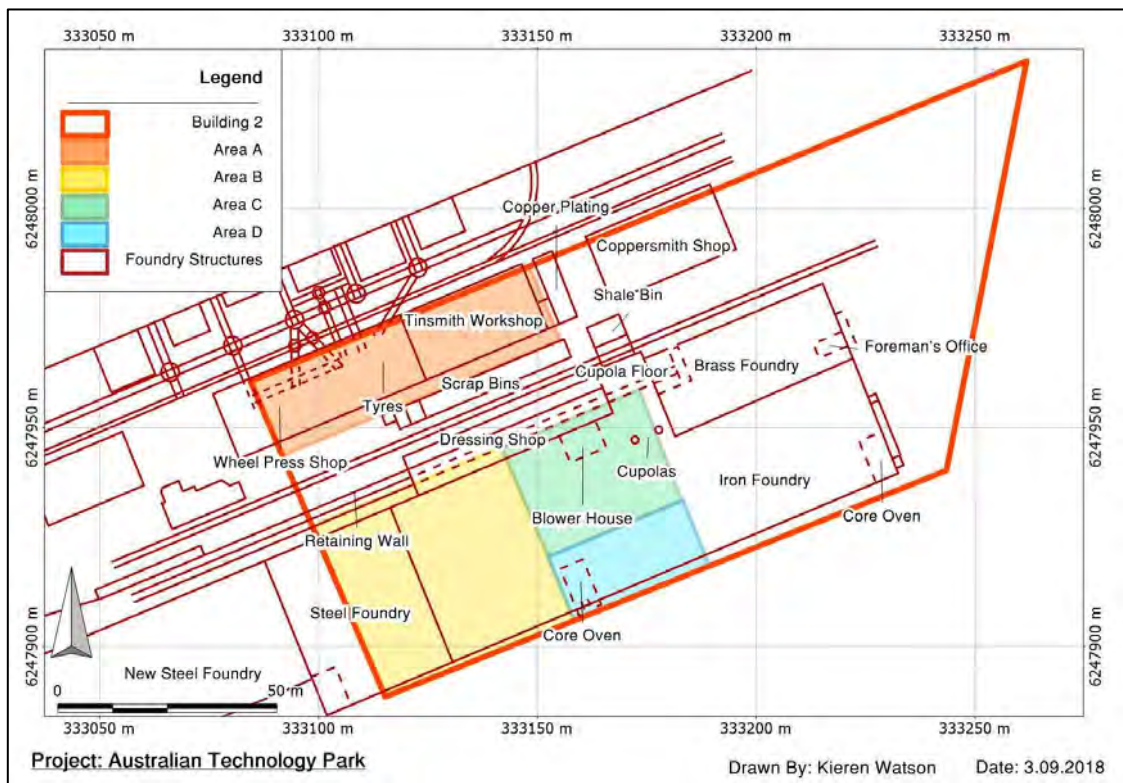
Building 2 Excavation and Monitoring zone with former Foundry plan overlaid (Source: Curio 2018)
